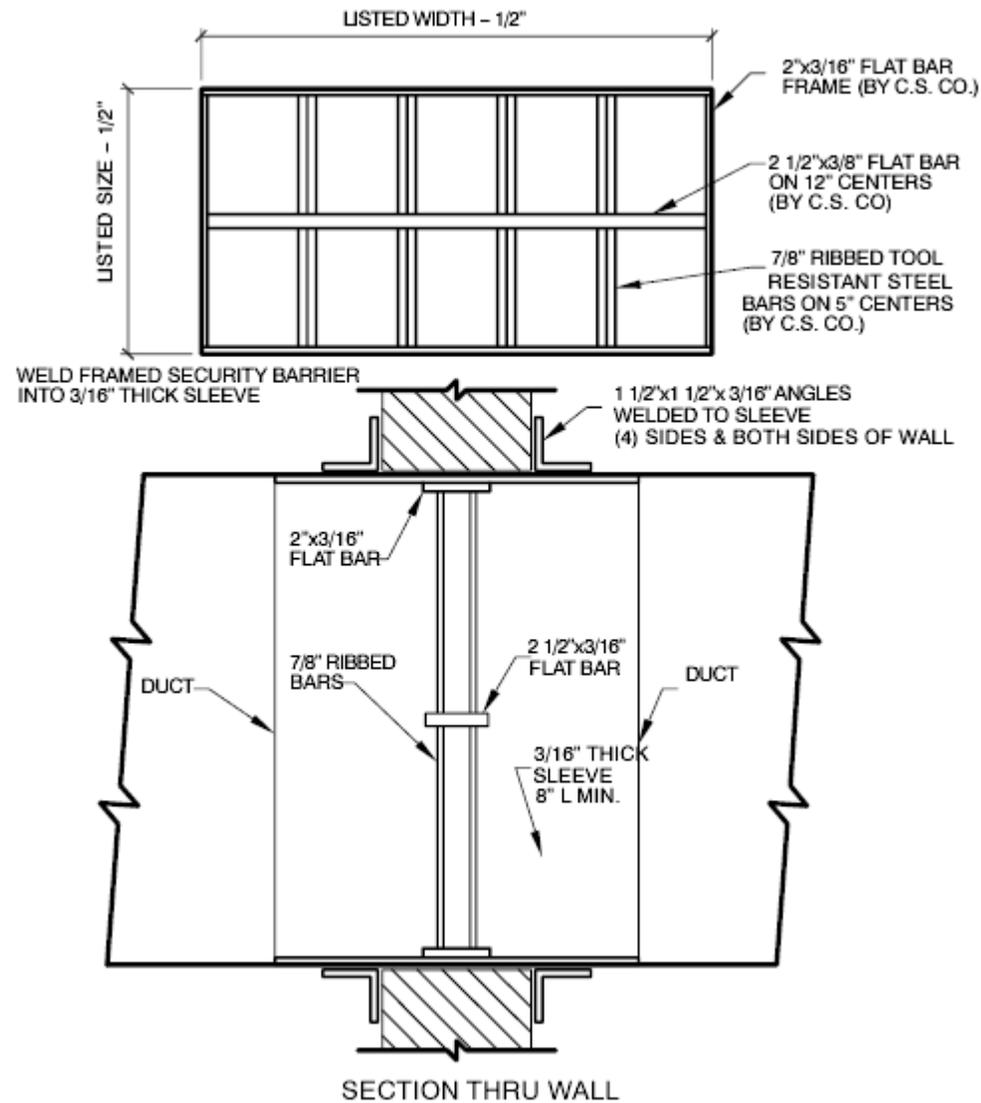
SECURITY DUCT BARRIER DETAIL
